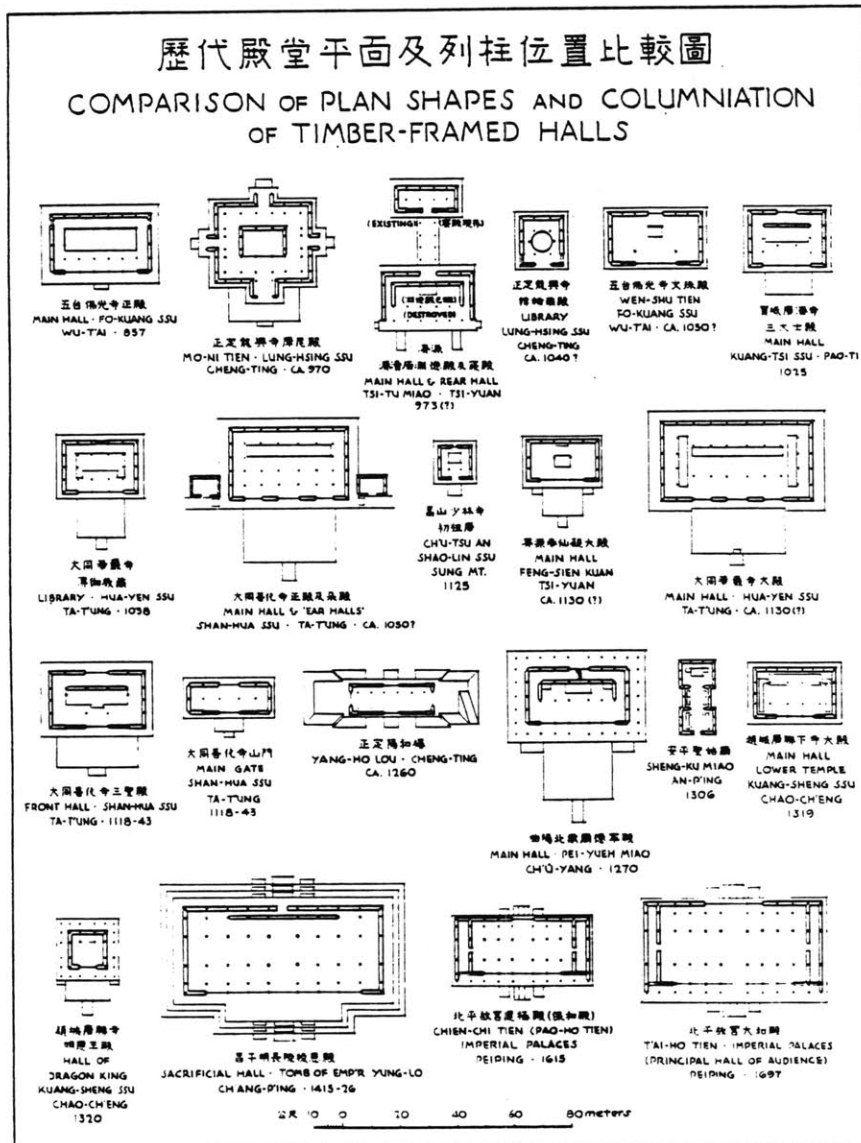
Comparison of plan and columniation of timber-frame halls
